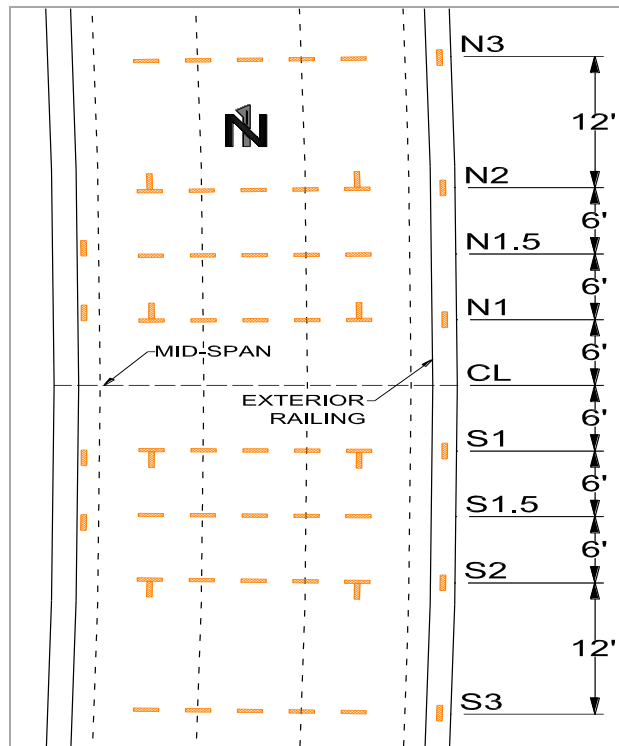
Arrangement of the concrete gages on concrete deck Test 2 [Neuman, (2009)]
